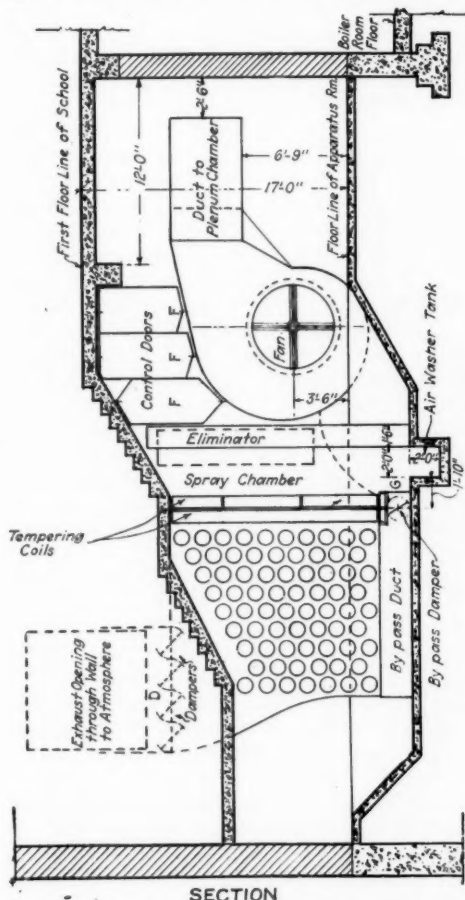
NEW DESIGN OF HEATING SYSTEM FOR SCHOOL BUILDING OF THE ST. LOUIS BOARD OF EDUCATION, SHOWING METHODS OF INCORPORATING OZONE APPARATUS.
